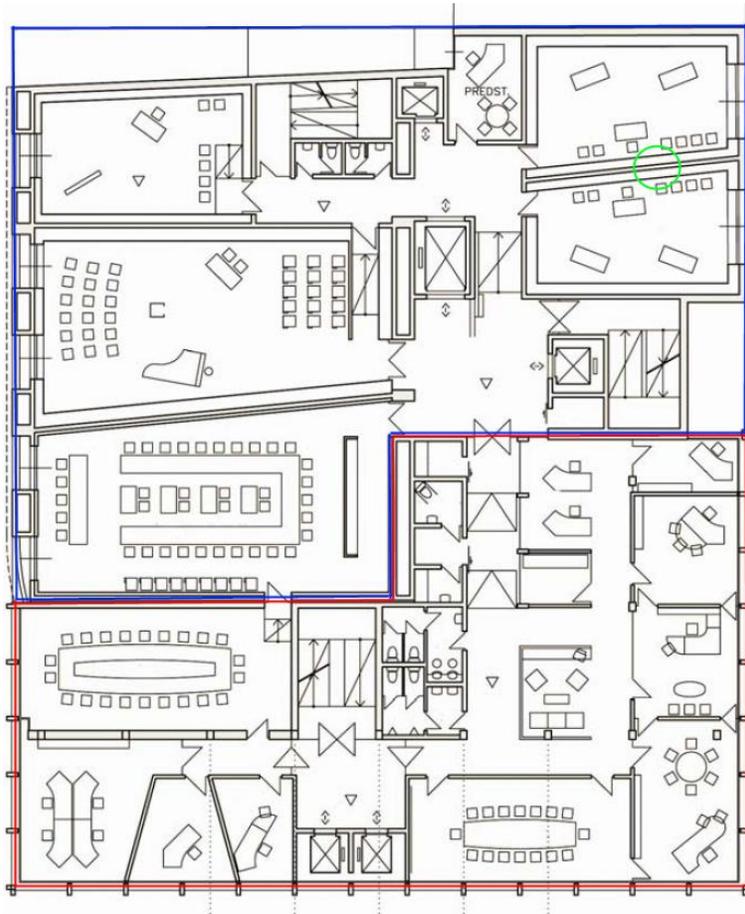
Plan of the 3rd floor of the new building [12]. The old office building is shown in red, and the newly added part in blue. The green circle indicates a detail of a double wall construction.
